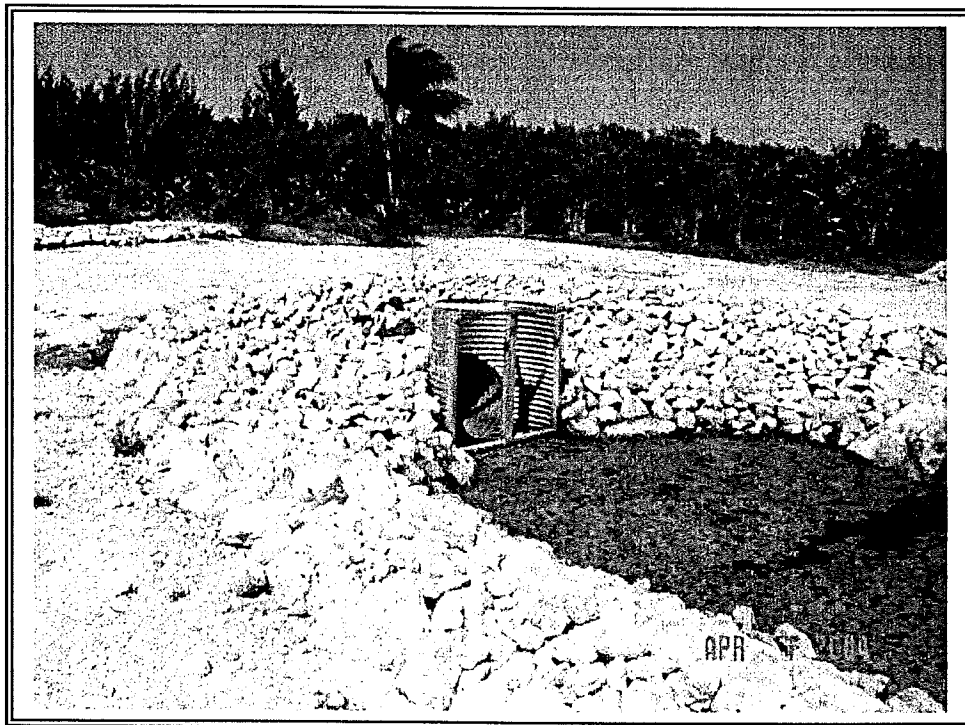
Photograph of internal road crossing and drainage control structure.
